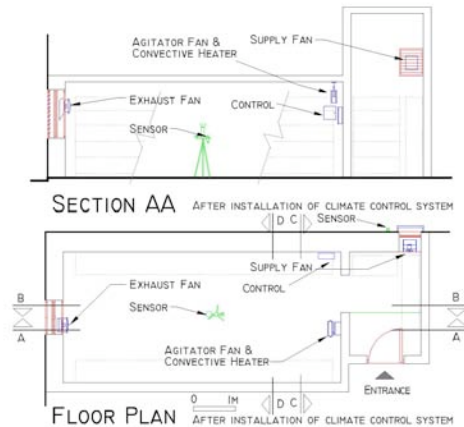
Plan and cross section of the two rooms where the alternative climate control system was installed, showing where the mechanic units and sensors are located.
